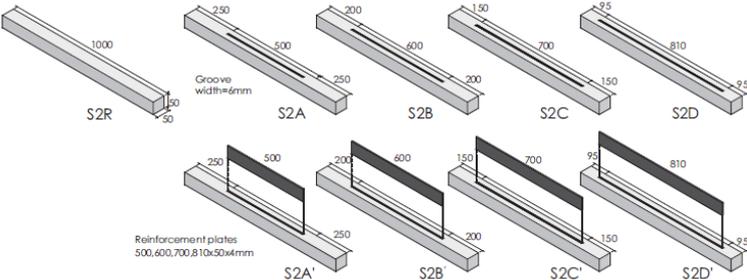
Samples to test the Reinforcement system 2 (S2).
